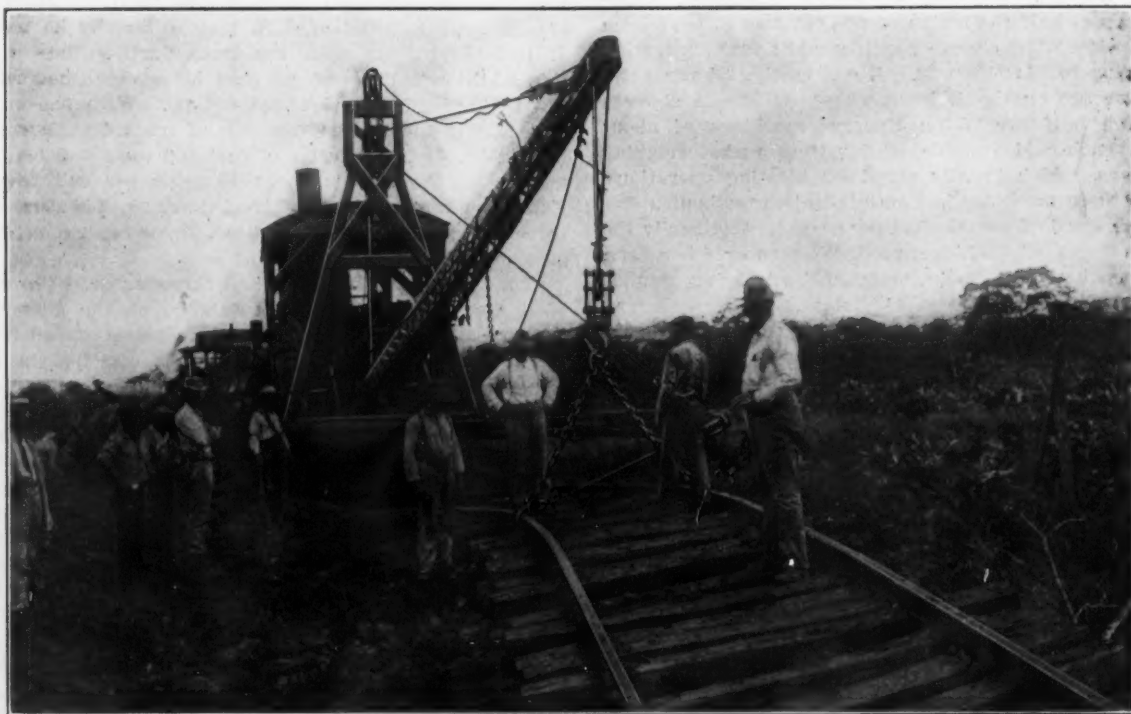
The Bierd Track Raising and Shifting Machine at Tabernilla Dump.
